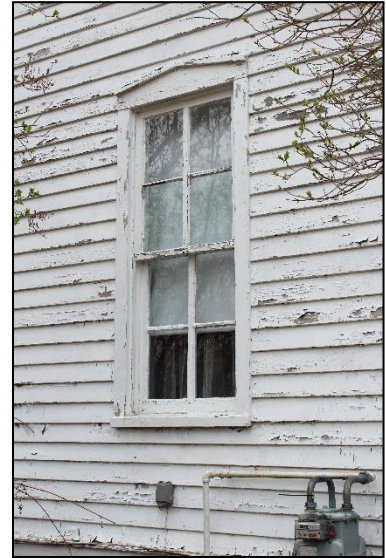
Typical 4/4 double hung window without decorative hood. East elevation of northeast Ell, facing southwest.
